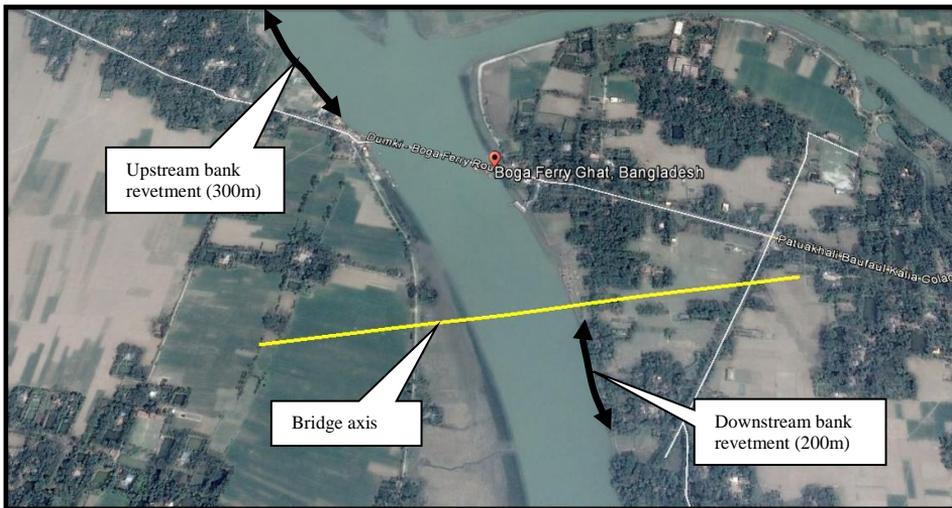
Placement and length of suggested bank revetments upstream and downstream of the bridge
